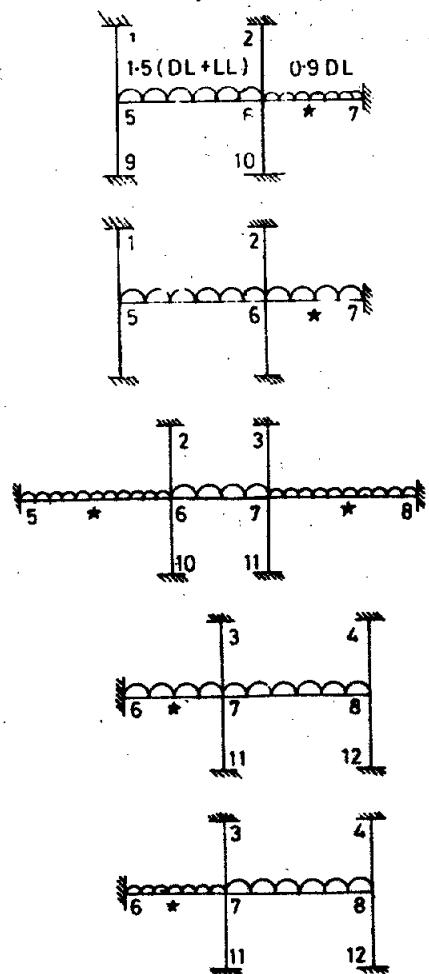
(e) Substitute Floor Frame-I Loading Cases.
